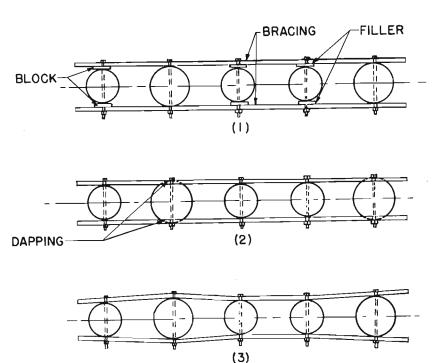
Methods of blocking and dapping piles for bracing to compensate for different size piles.
